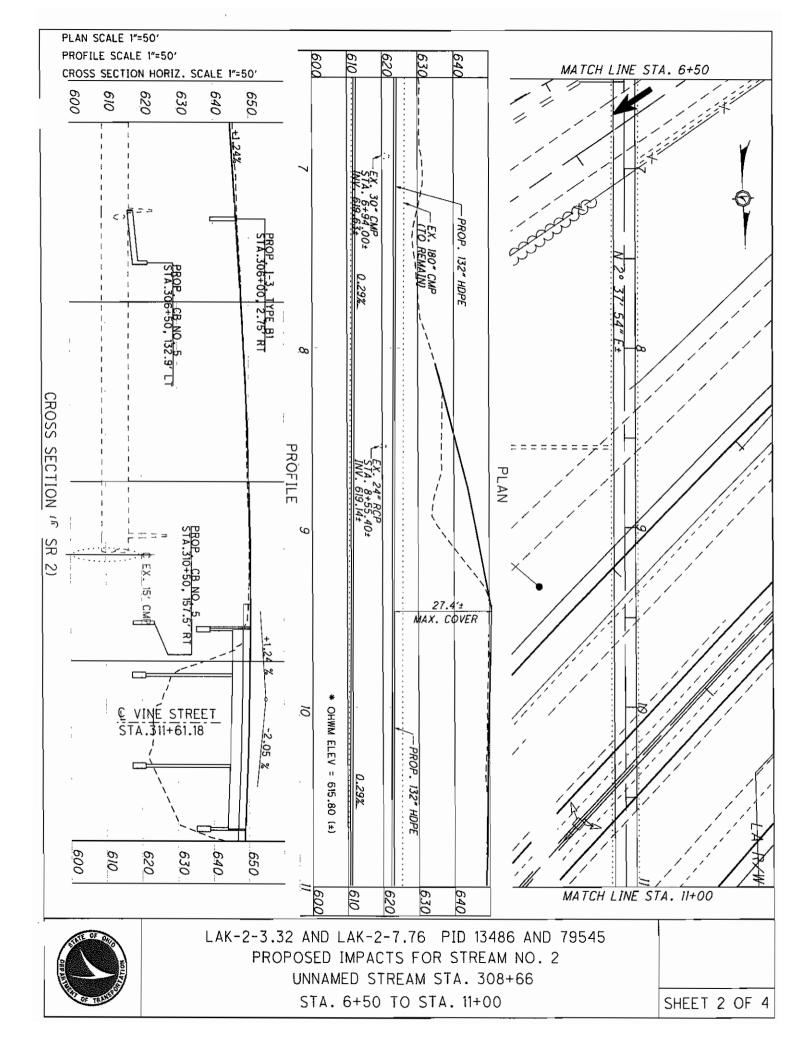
Sheet 14 of 14 Figure 6. Plan views of stream and wetland crossings.
